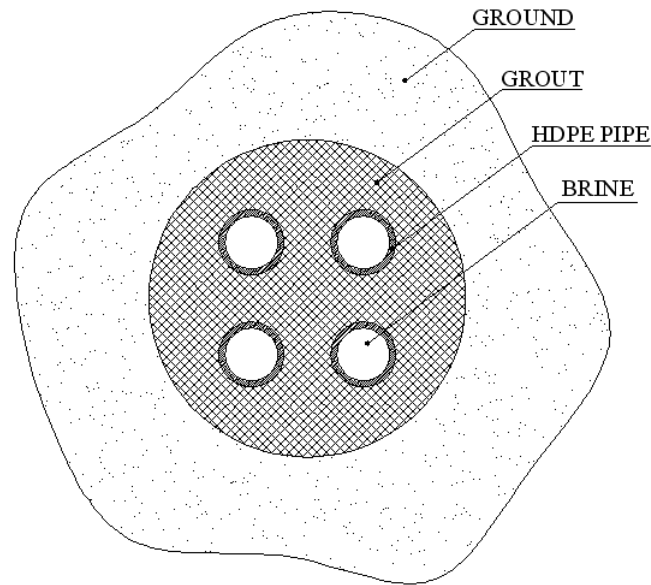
Sketch of a double U-tube BHE cross-section
